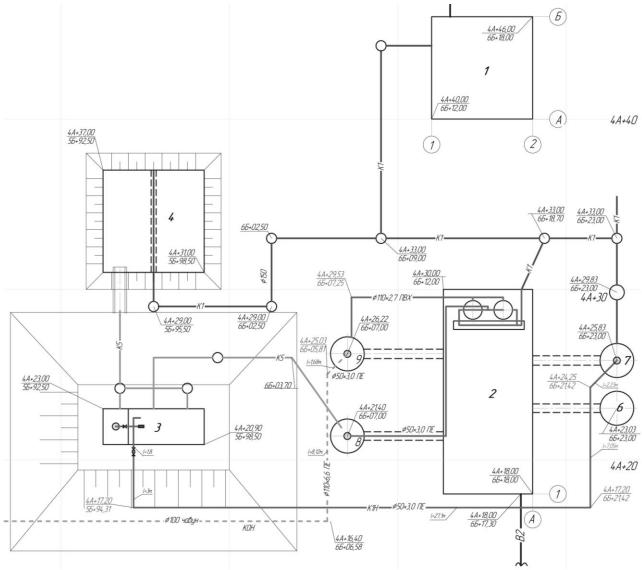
The general plan of sewerage cleaning constructions of water drainage in OGC Stepove
